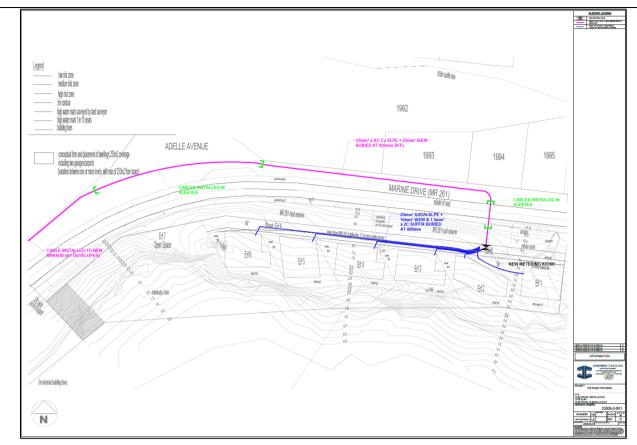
Electrical Sleeve Layout Plan – See Appendix G10
